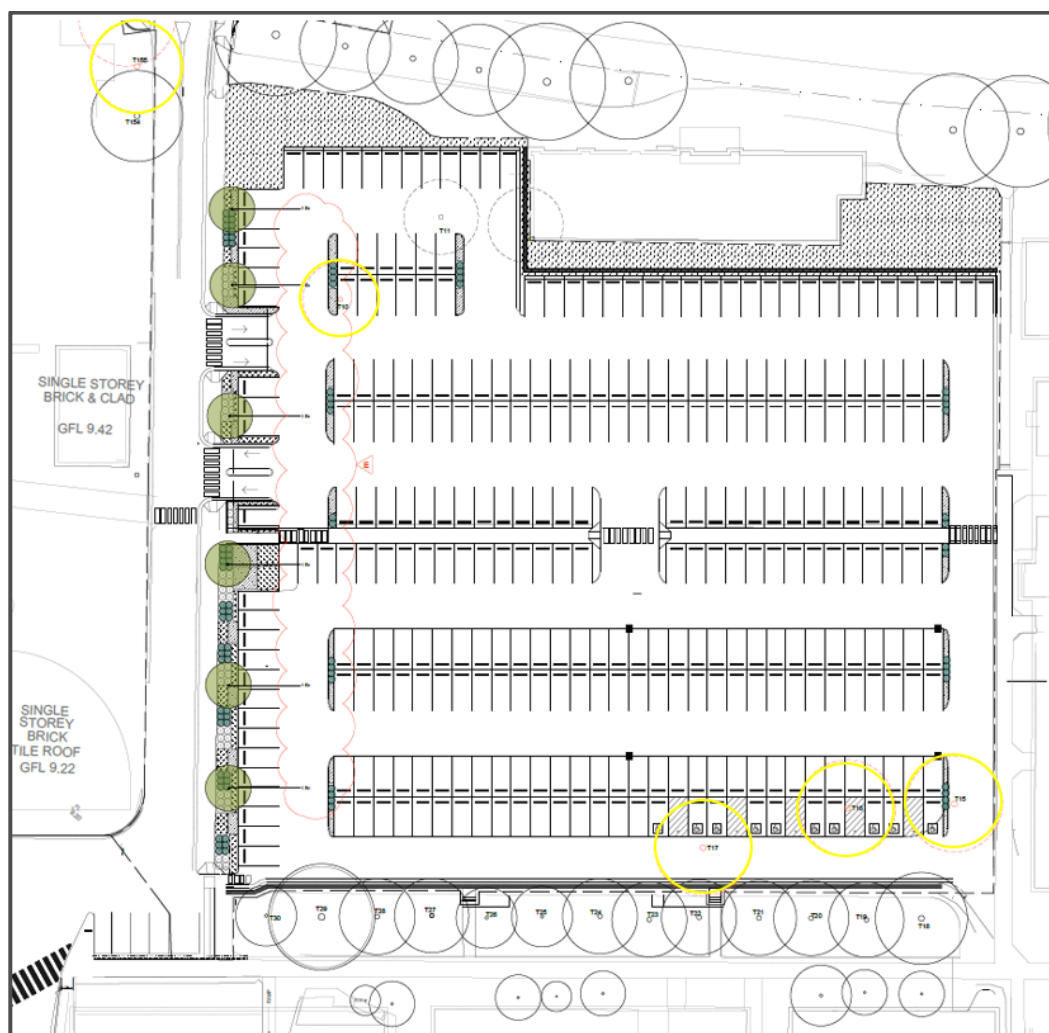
| At-grade carpark trees for removal highlighted in yellow and proposed replacement trees shown in green. (Source: Applicant's landscape plans)
